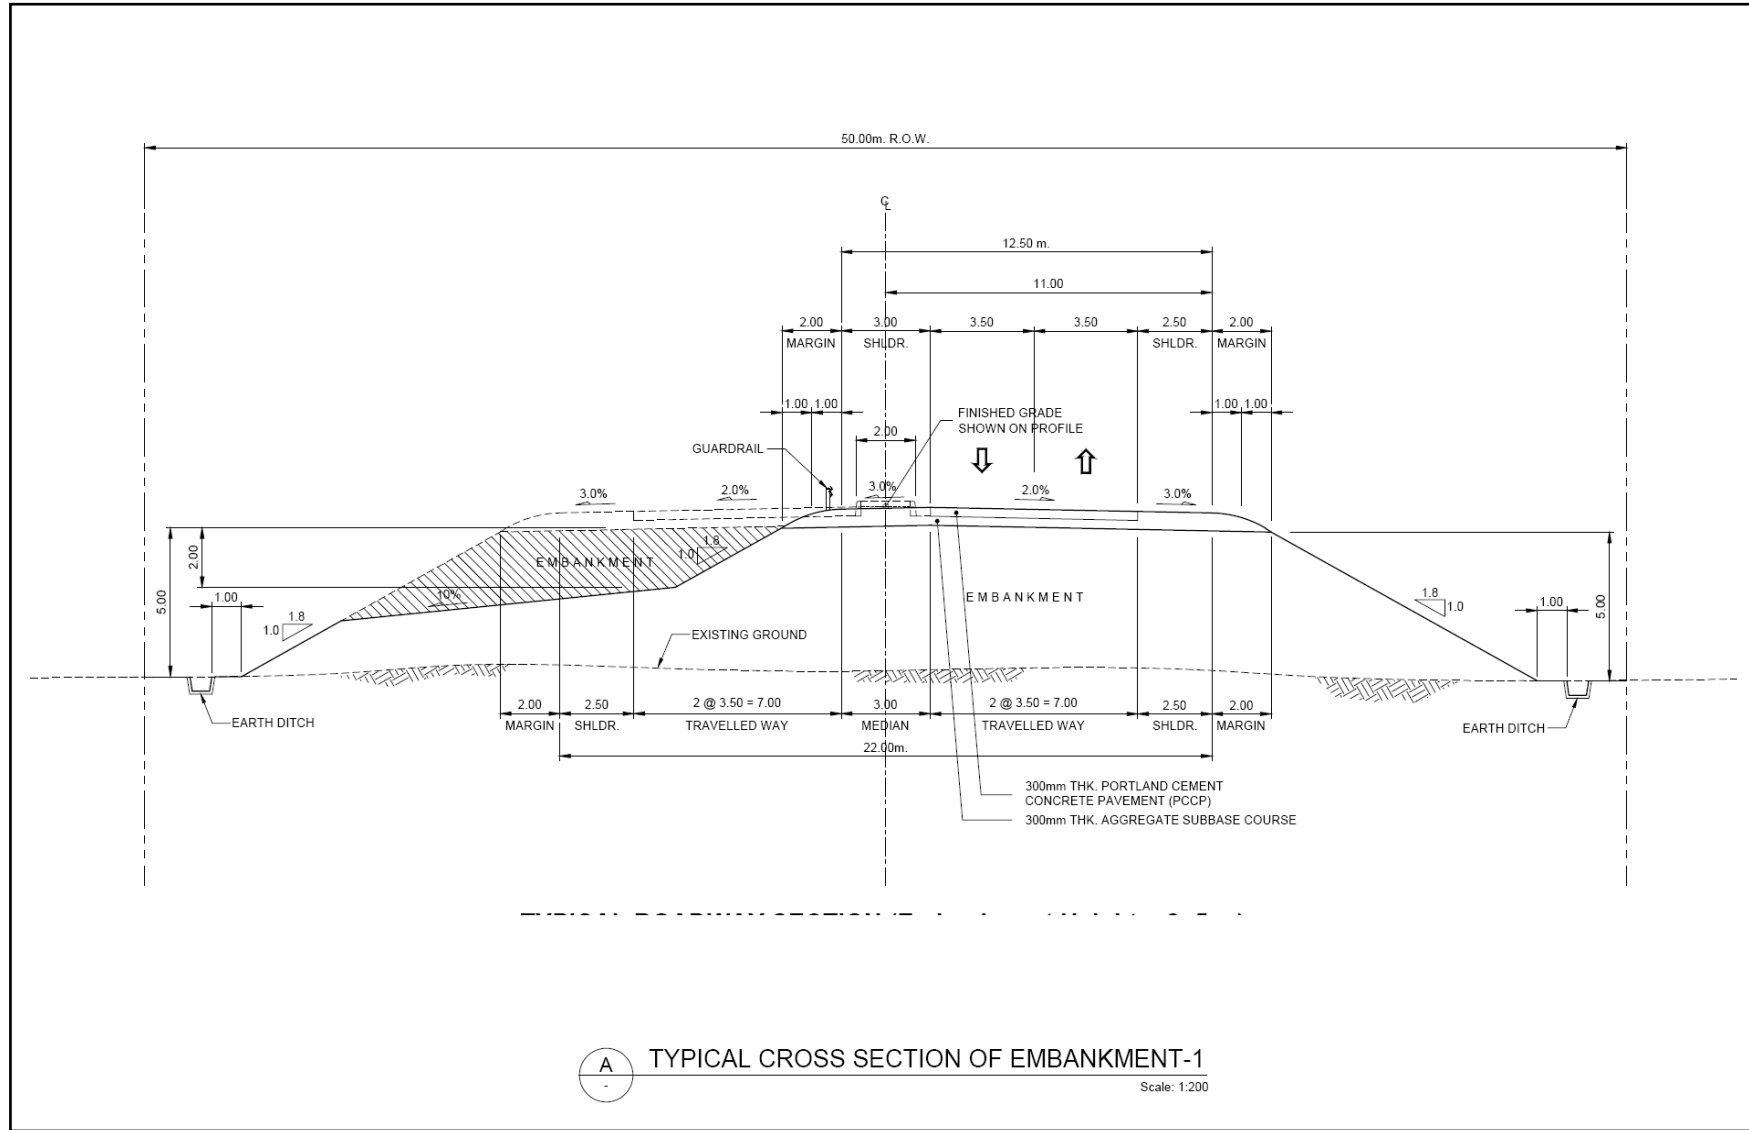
(3) TYPICAL ROADWAY CROSS SECTION EMBANKMENT-1
